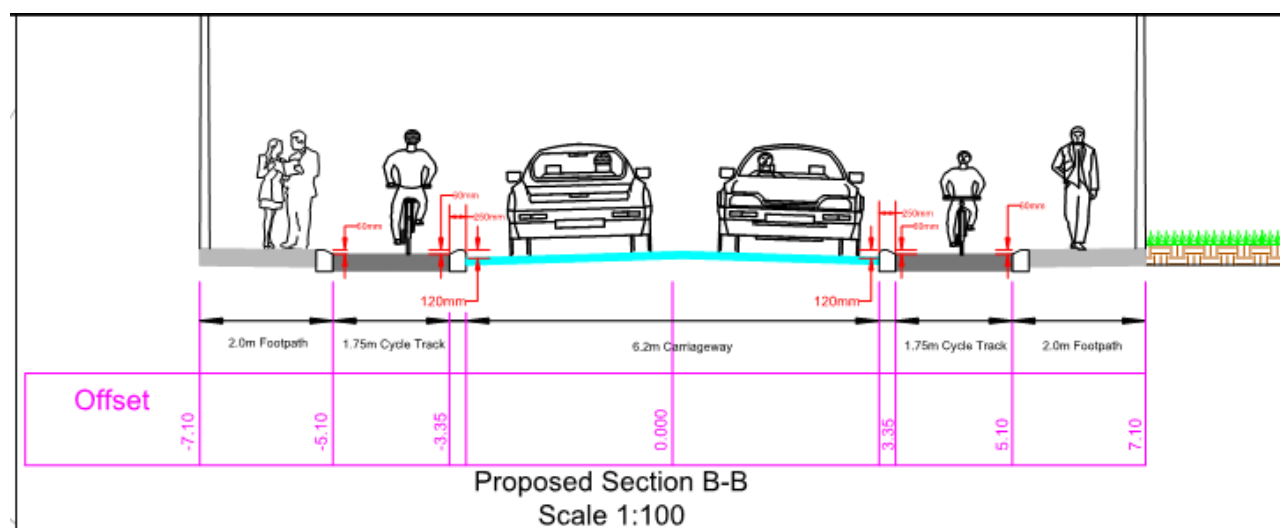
Typical Cross Section showing proposed footpath, cycle and road carriageway arrangement.
